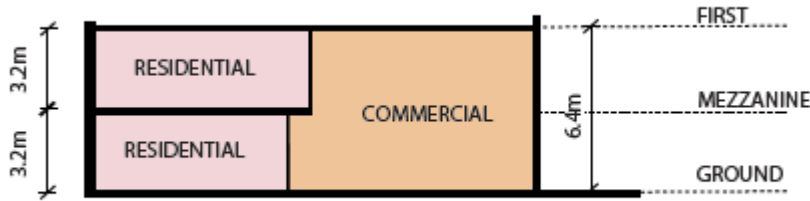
COMMERCIAL GROUND FLOOR SECTION
